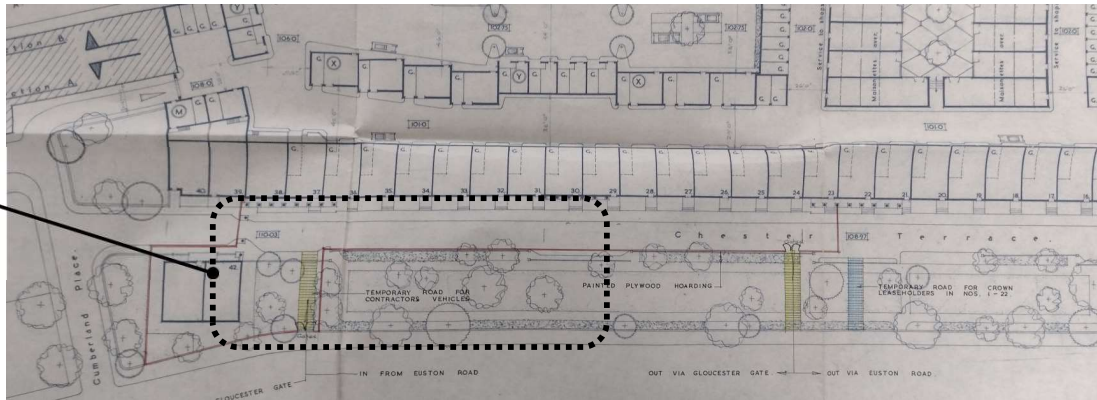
Extract of Construction Methodology Plan from 1960’s Redevelopment of Chester Terrace
